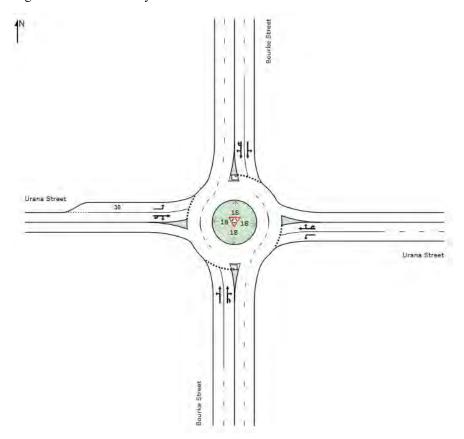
Bourke Street/Urana Street SIDRA intersection layout
